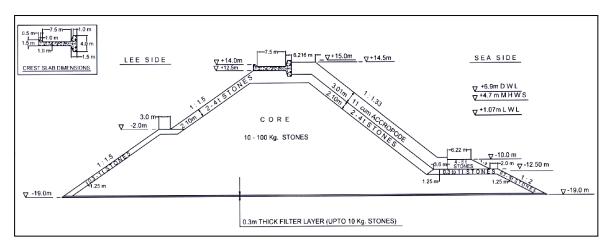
Cross-section of breakwater (-19.0 m bed level).
